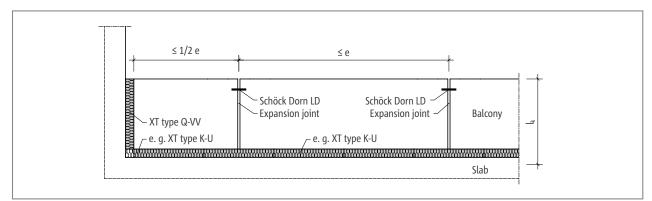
Schöck Isokorb® XT type K-U: Expansion joint configuration
